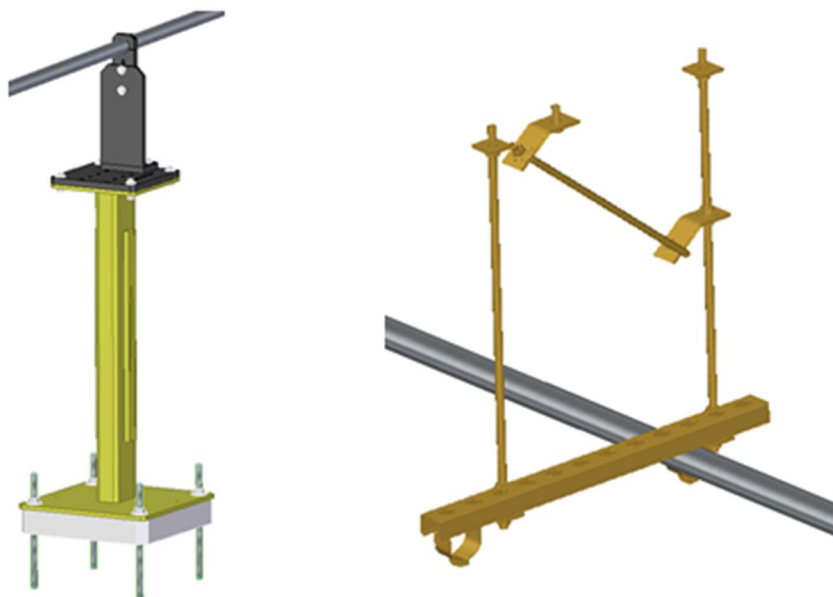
Floor-Mounted Drift Support, left, and Ceiling-mounted Drift Support, right
